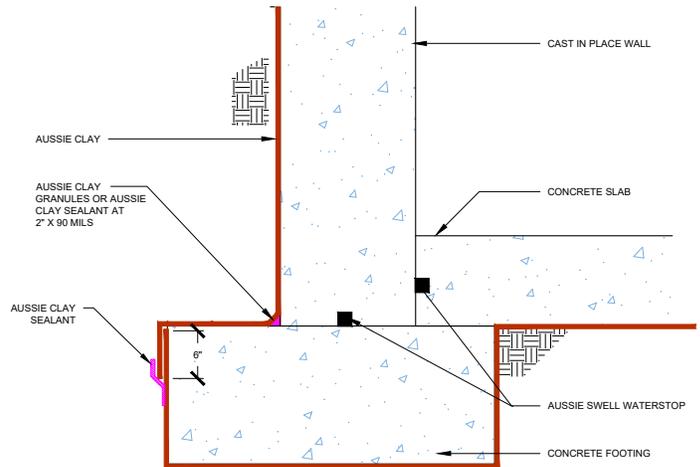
HYDROSTATIC SLAB ON FOOTING
